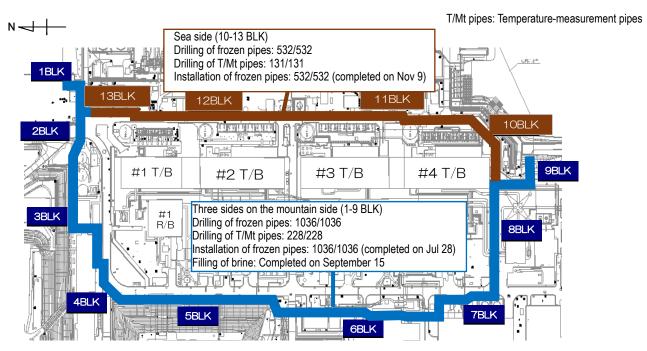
Drilling status for frozen-soil impermeable walls and installation of frozen pipes
